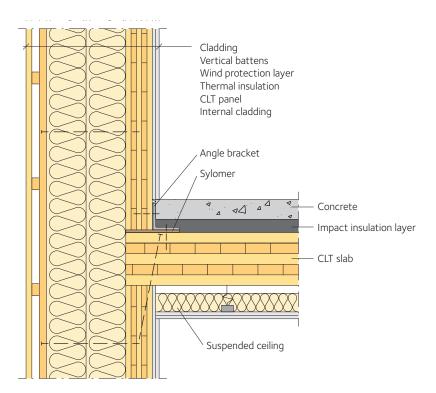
Vertical section for building with high demands regarding sound insulation. Joint to exterior wall.
